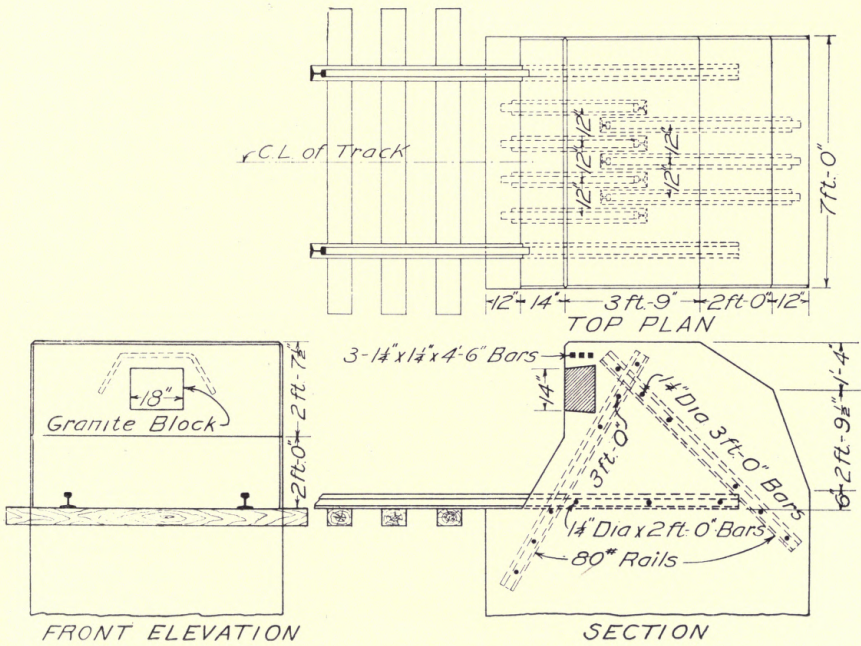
STANDARD CONCRETE BUMPING POSTS, D., L. & W. P. R.
